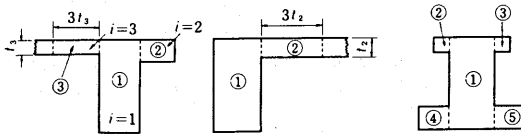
dividing original T,L and I sections into small rectangular sections
